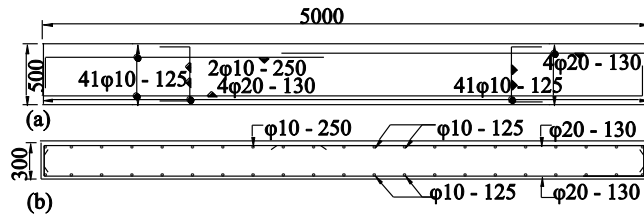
Reinforcement layout for test specimens: (a) top view of BS1; (b) cross-section of BS1; distances and diameters in [mm].
